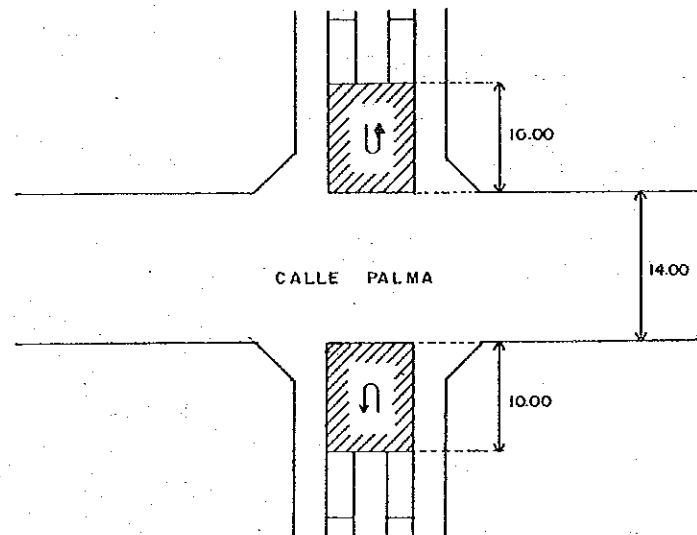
U-TURN ZONE OF PALMA STREET
